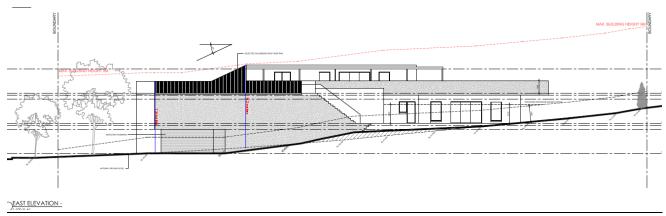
East Elevation - Height. Source: Architectural plans prepared by Janssen Designs.
